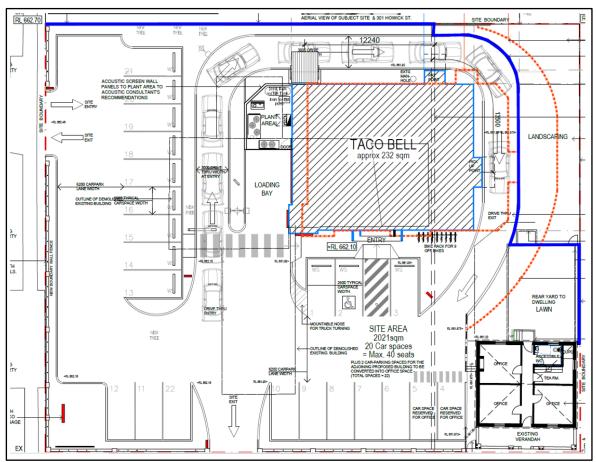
Location of Proposed 2.1metre High Acoustic Wall (Shown Thick Blue)
